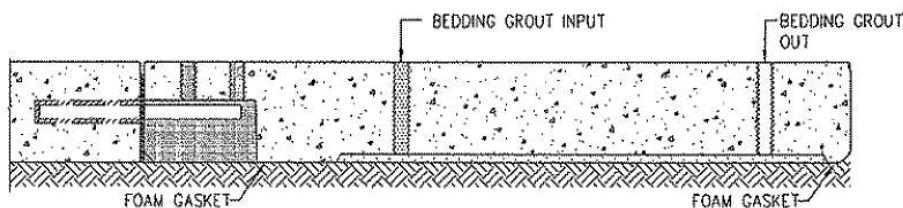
Cross section of JPPS showing dowelled connections between panels [6].
